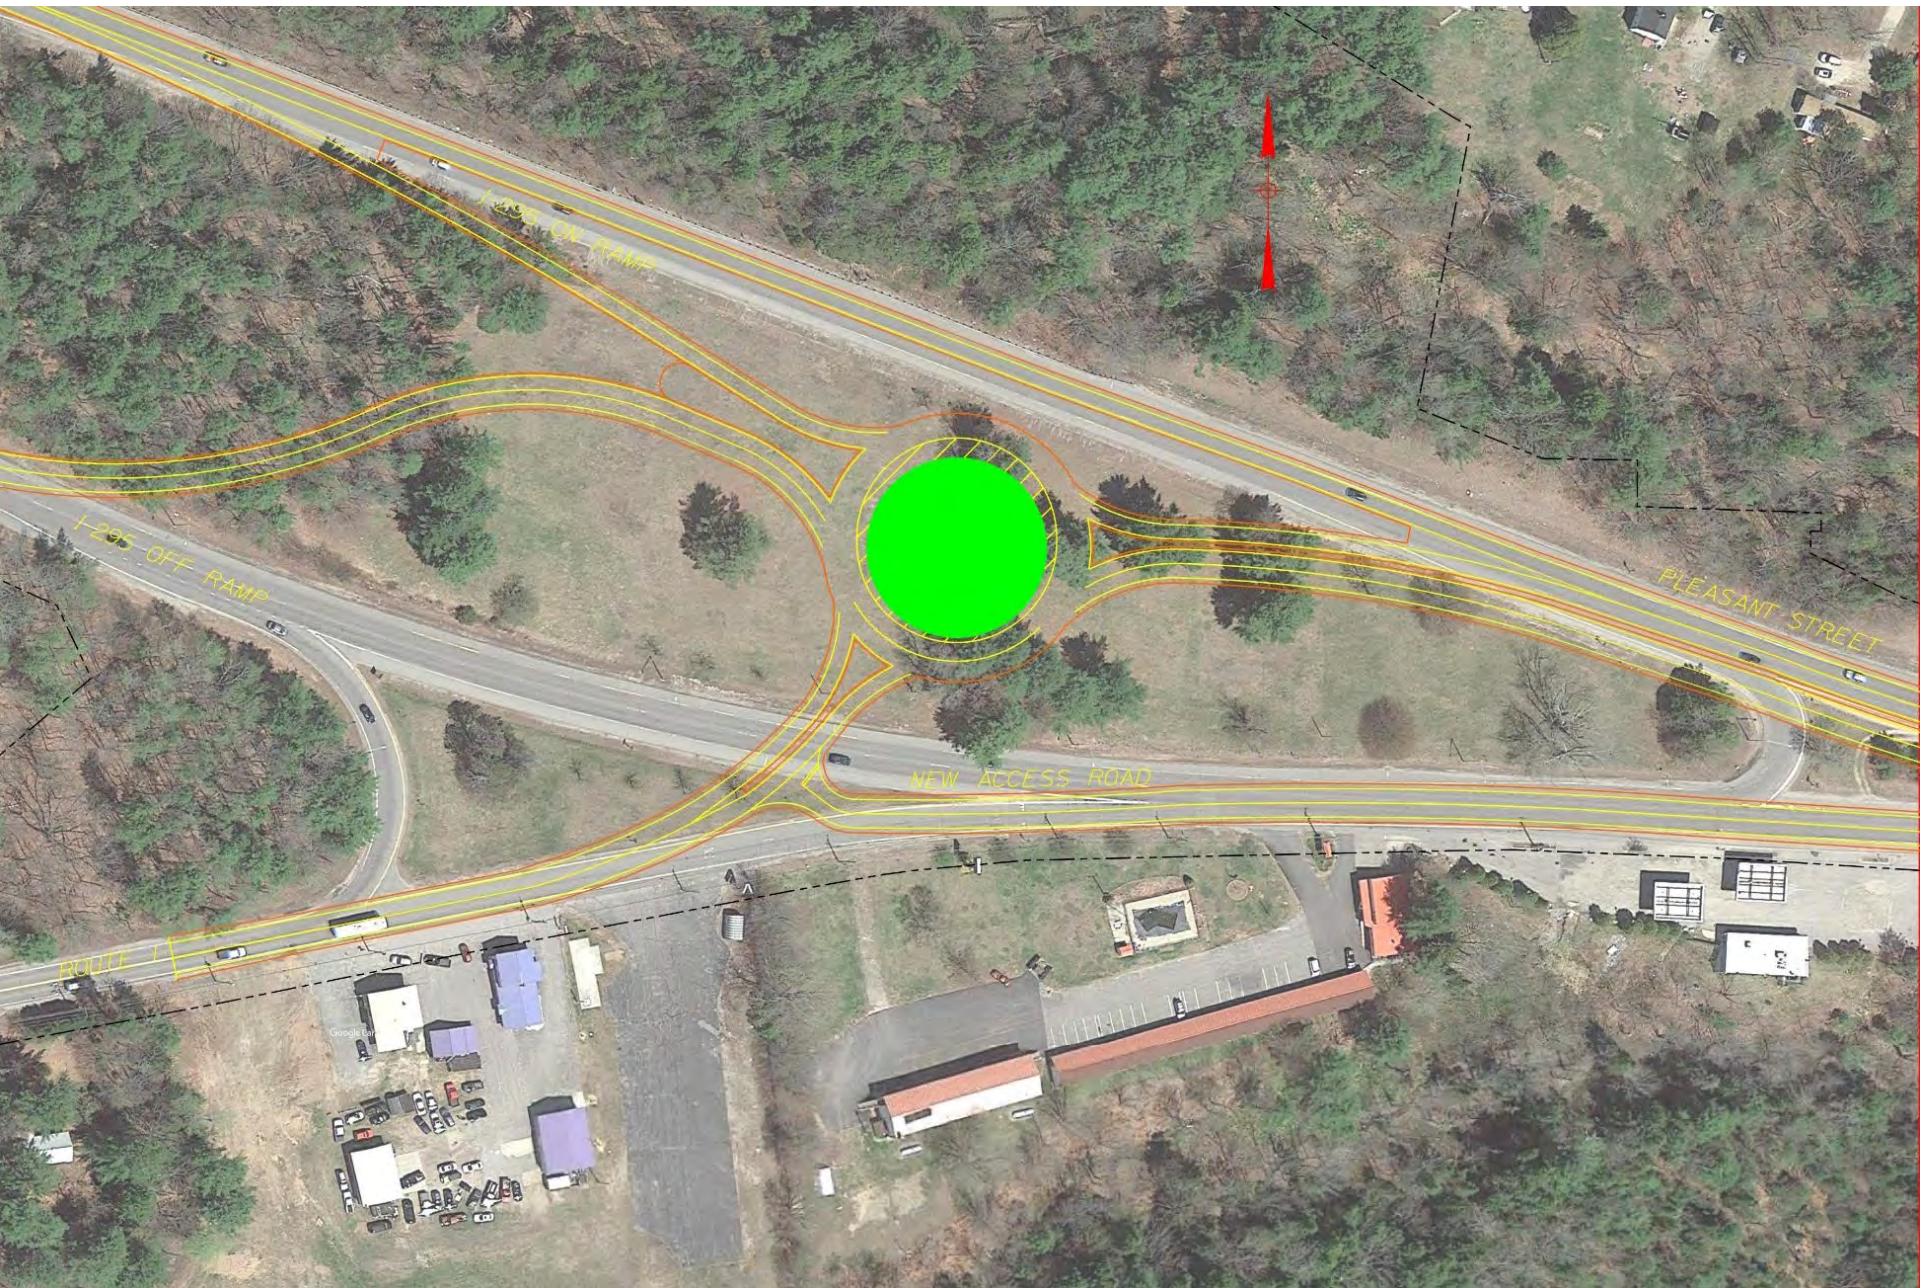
Pleasant Street/I-295 Ramps/Route 1 Improvements
